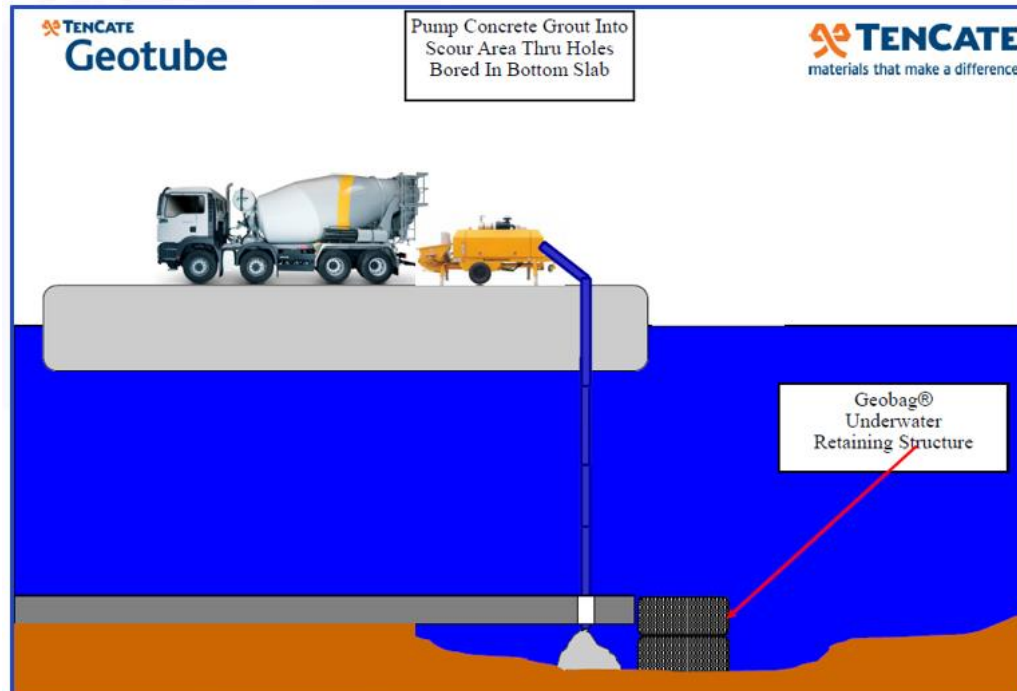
Method of Repair to Scour Erosion Under Slabs and Dividing Walls
